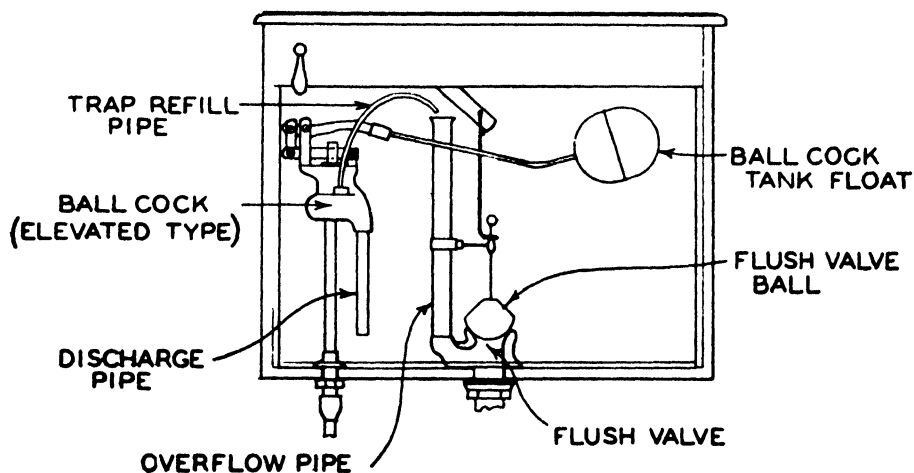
A toilet tank with an elevated ball cock.
